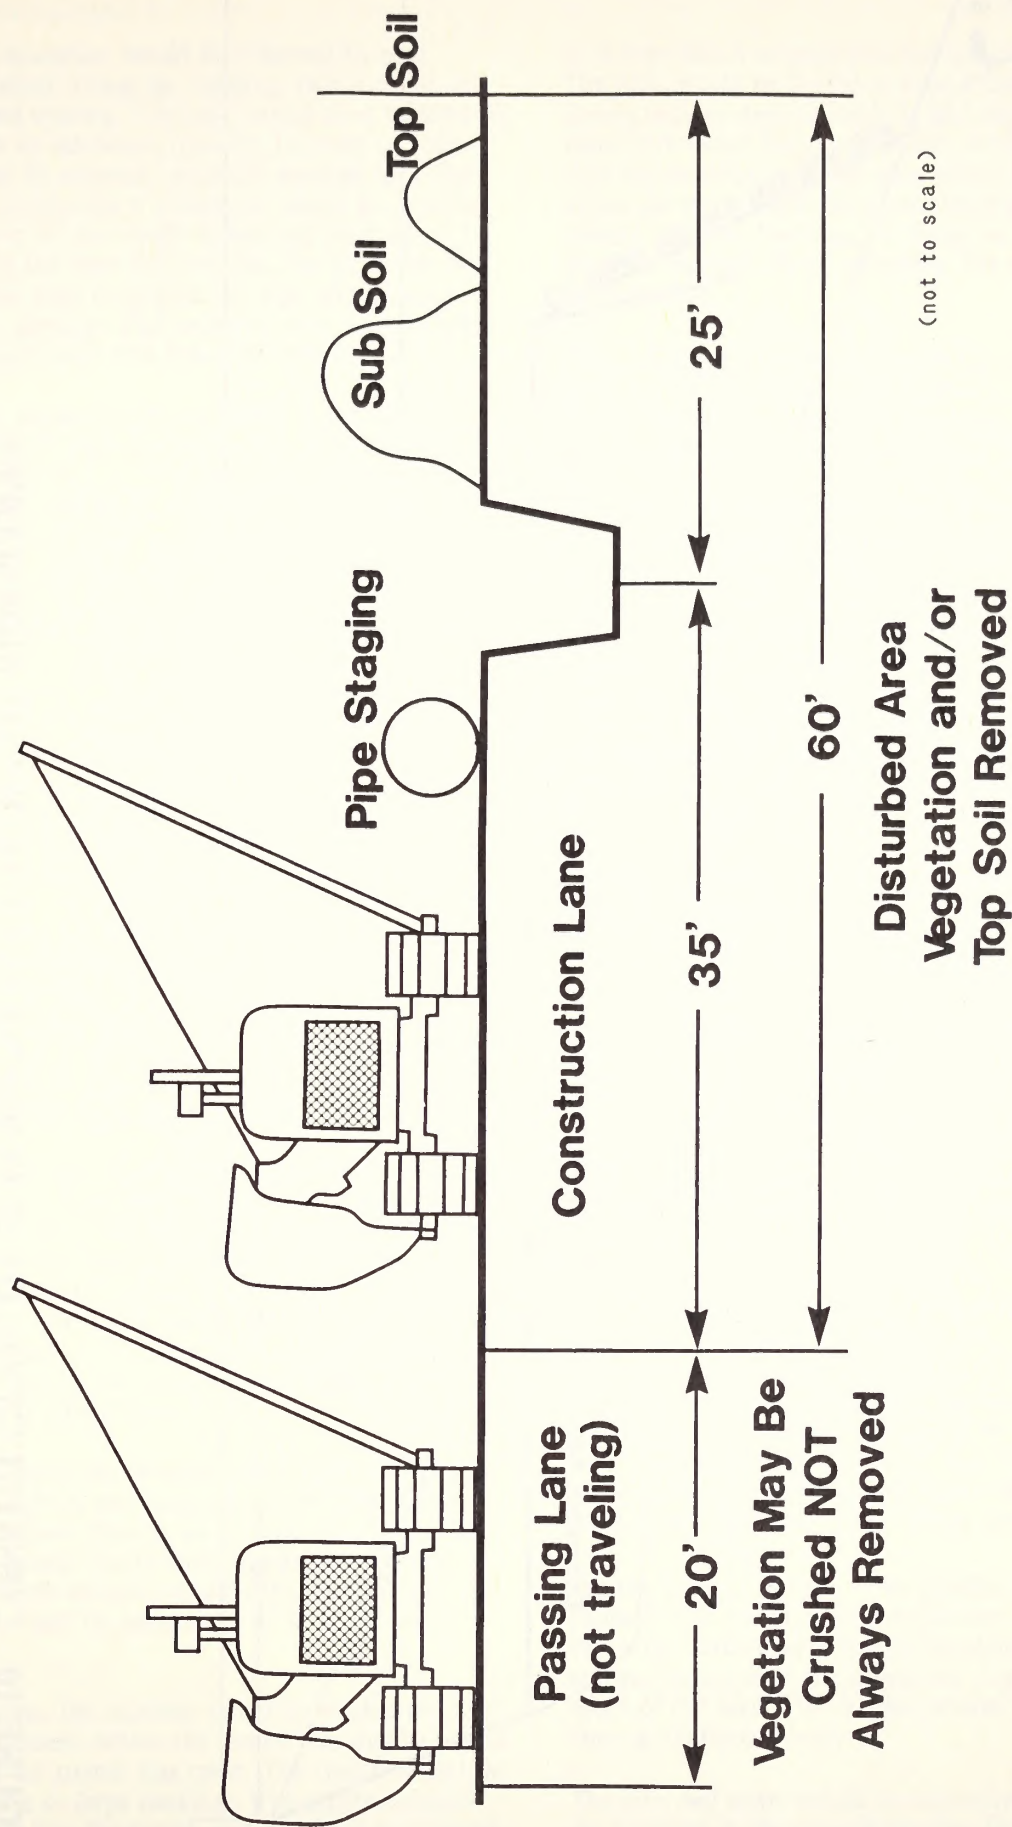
CONSTRUCTION ON LEVEL TERRAIN
